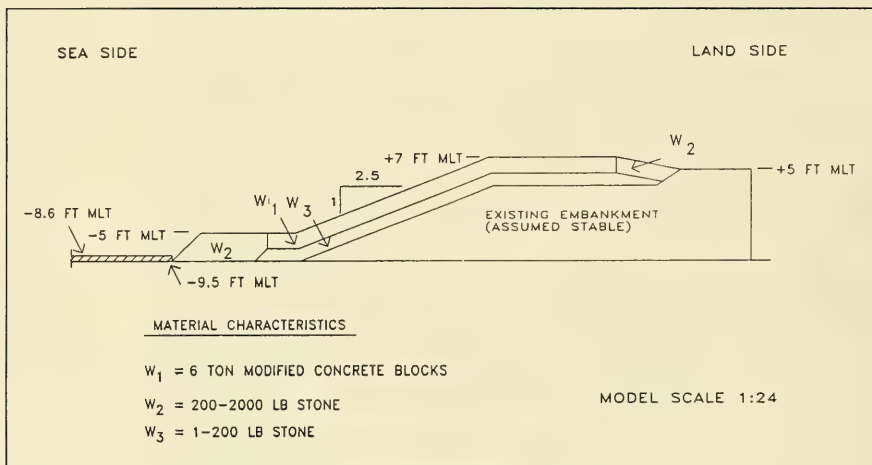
Modified concrete block revetment cross section, Plans 6 and 6R
